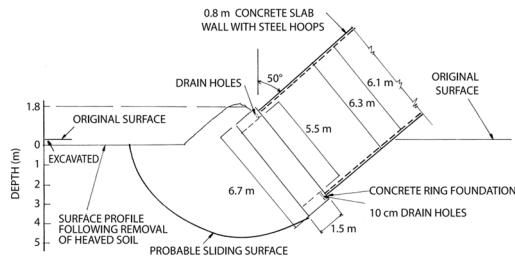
Details of the silo base after failure, New Liskeard (after Eden & Bozozuk 1962)
